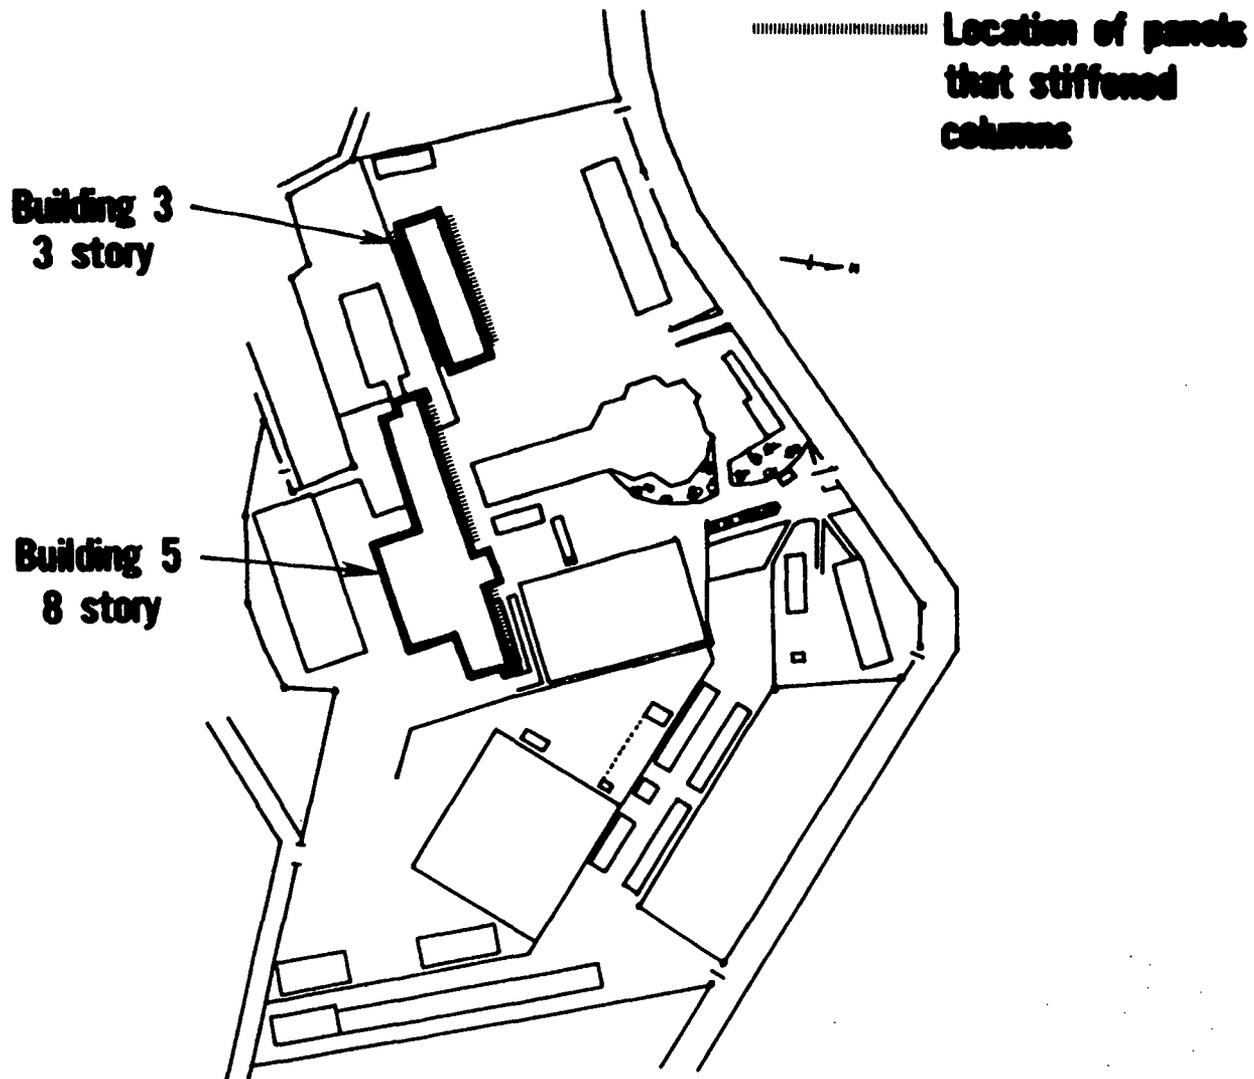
Tohoku Institute of Technology, Sendai, plan of campus. Hatching along walls of buildings 3 and 5 shows location of severely damaged columns.
